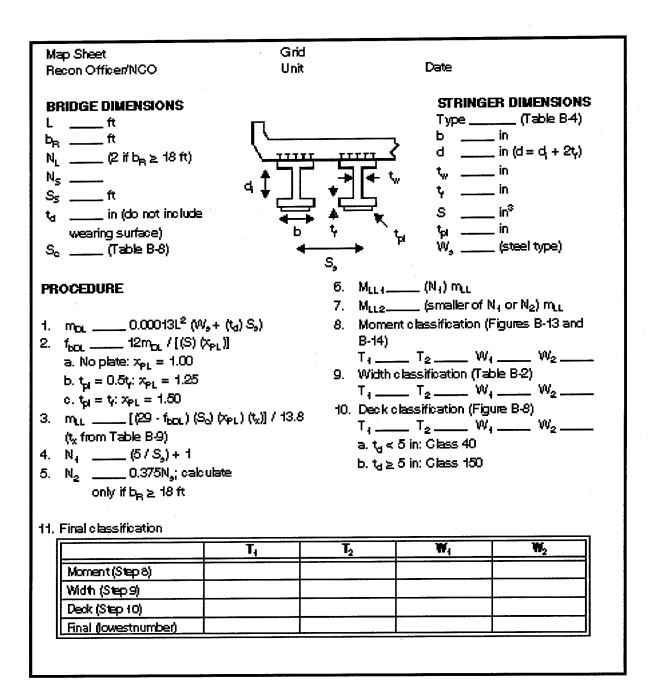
Concrete Steel-Stringer Bridge (Composite Construction)
